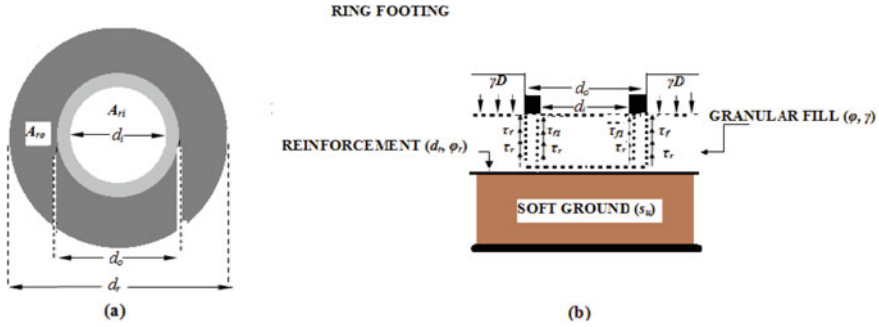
a Plan view of ring footing over circular geosynthetic sheet reinforcement b Schematic of ring footing
